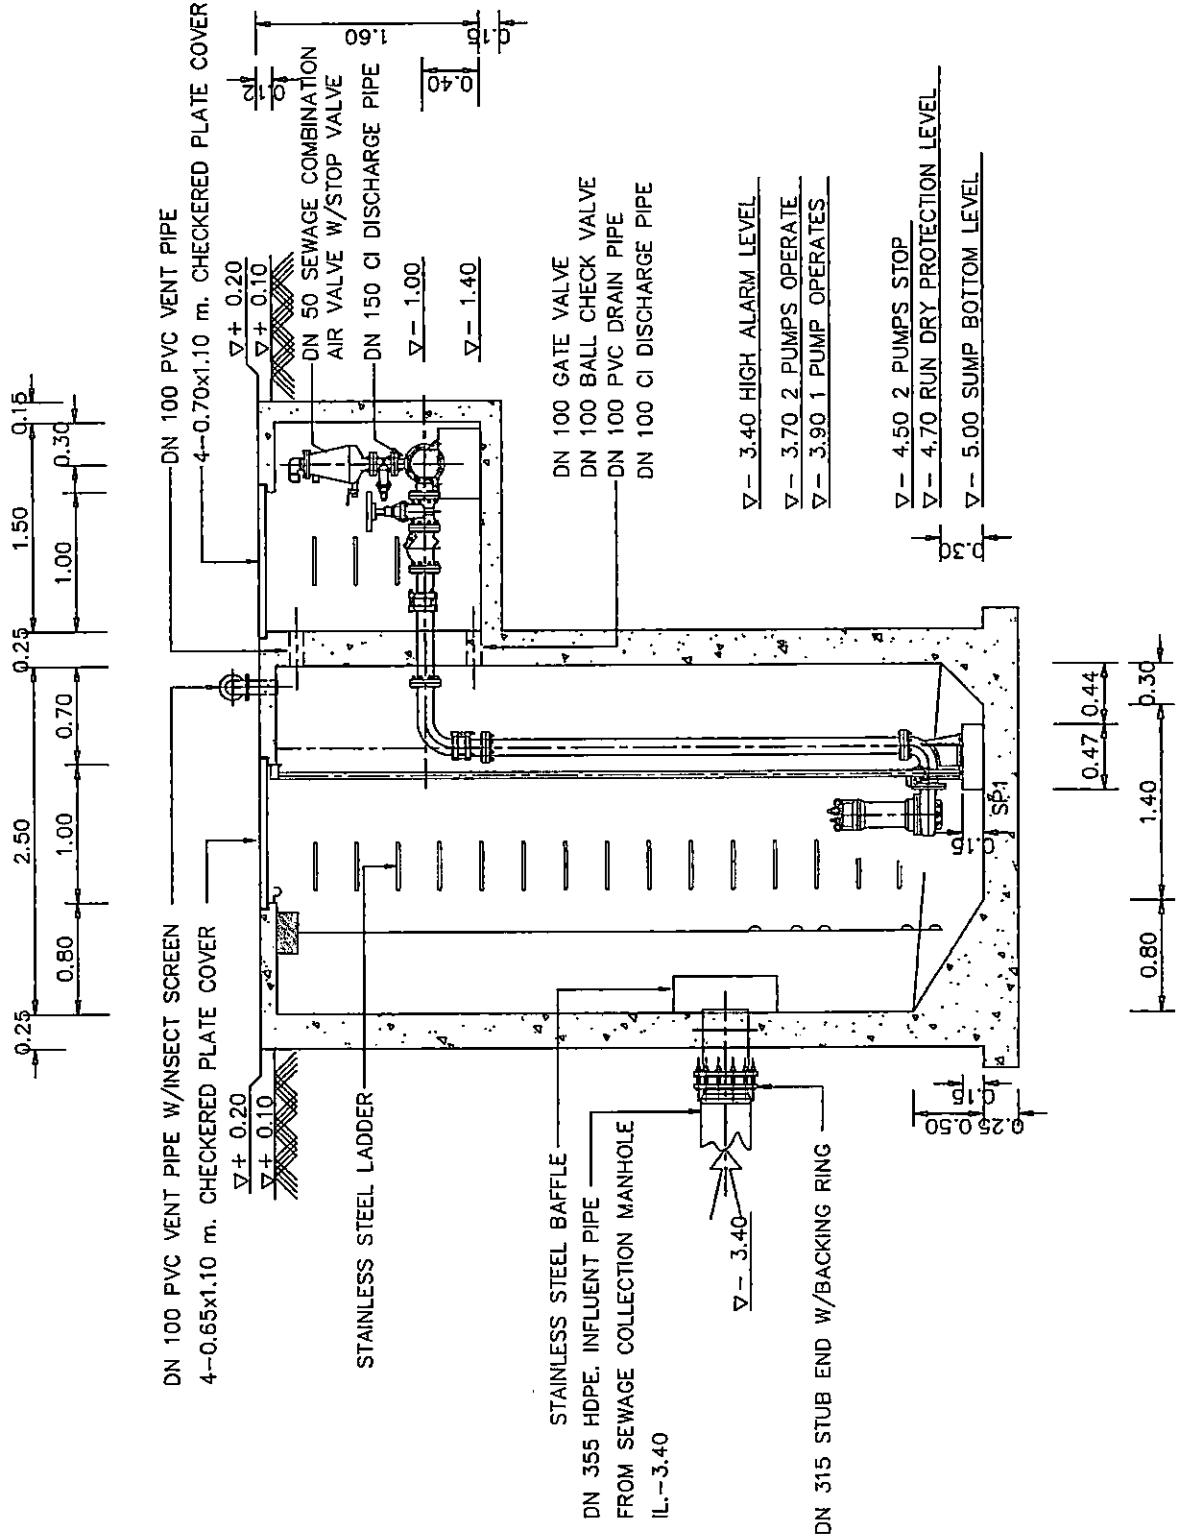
DETAIL OF PIPE CONNECTING AT SEWAGE (UNDERGROUND LEVEL)
